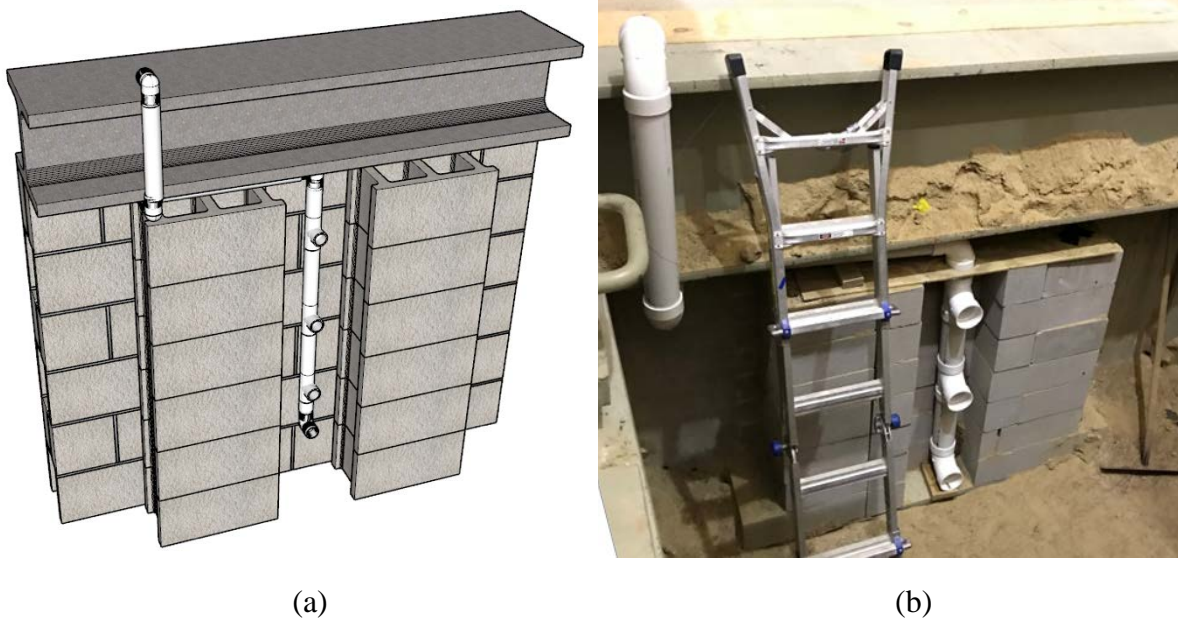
Soil box ventilation: (a) schematic design, and (b) constructed ventilation system.
